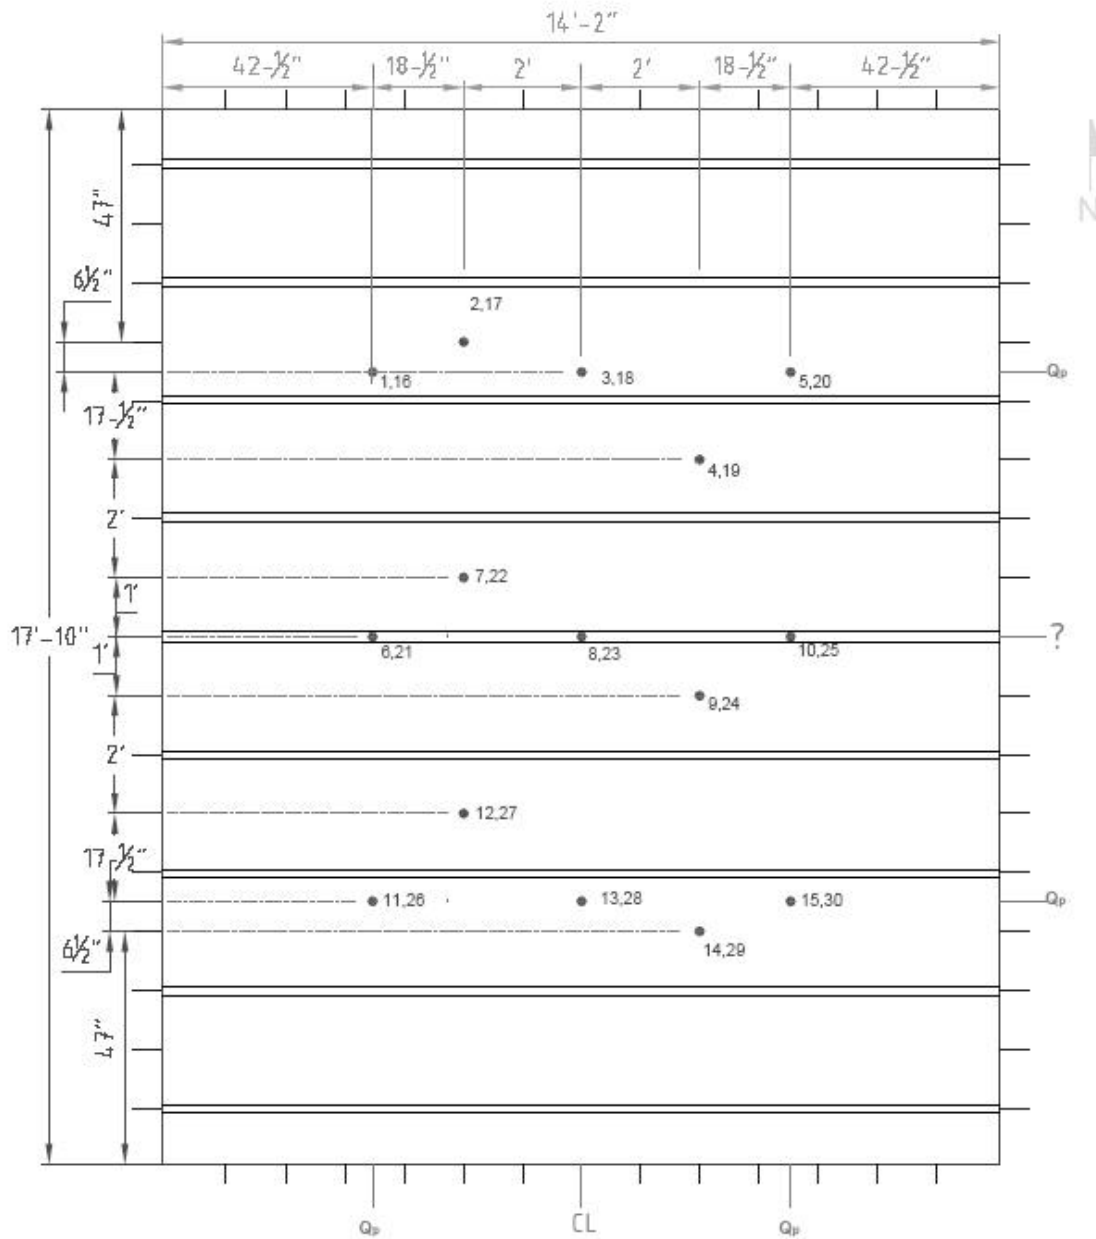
Thermocouple Locations on Sub-floor and Carpet Padding
